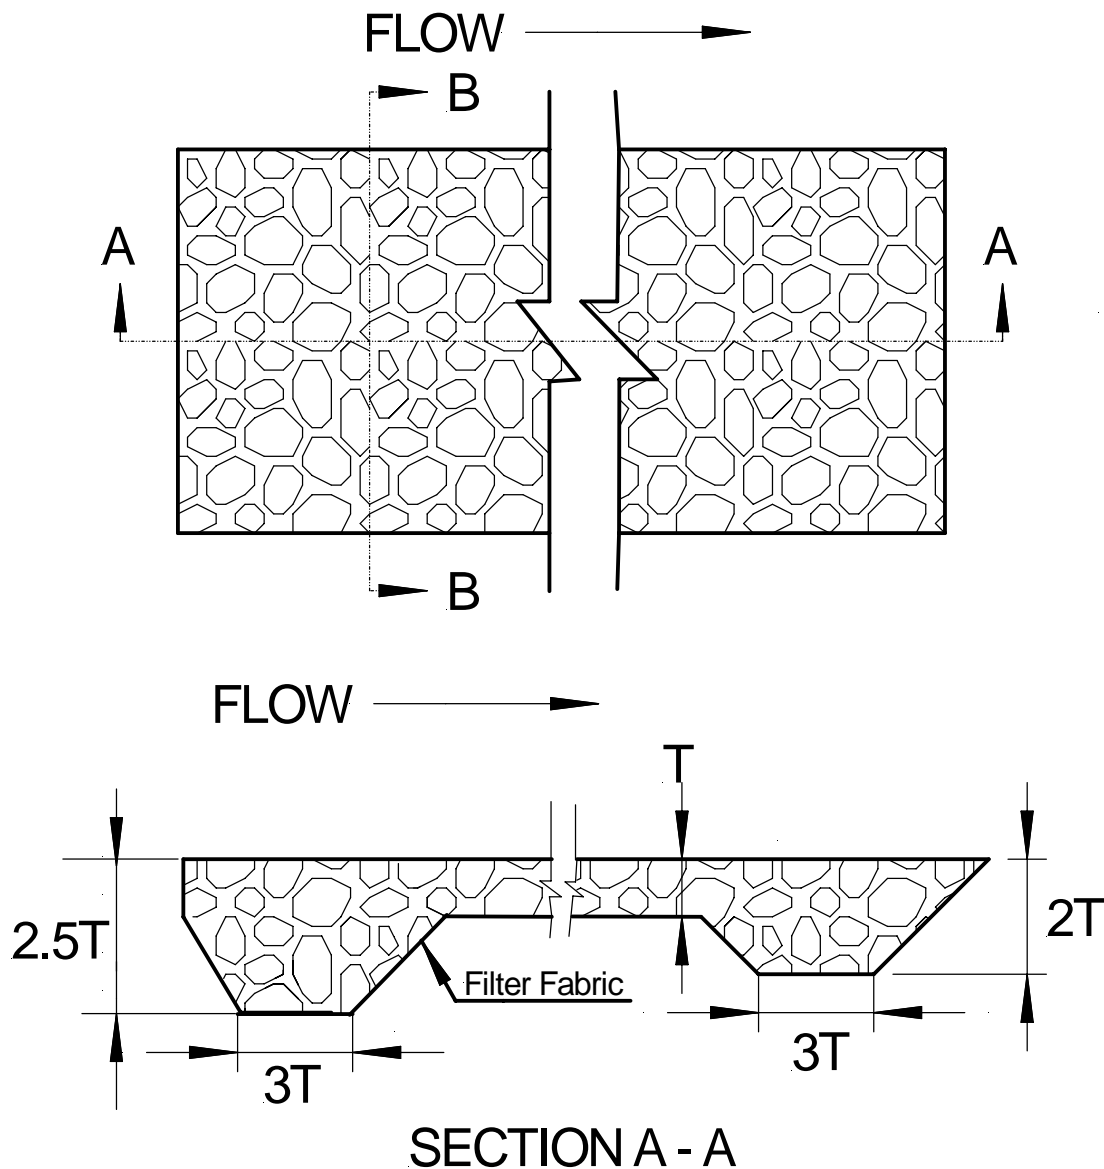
Typical Riprap Installation: Plan and Flank Details
